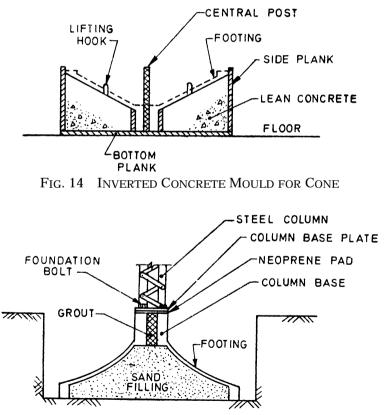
FIXING OF STEEL COLUMN TO PRECAST HYPAR FOOTING
